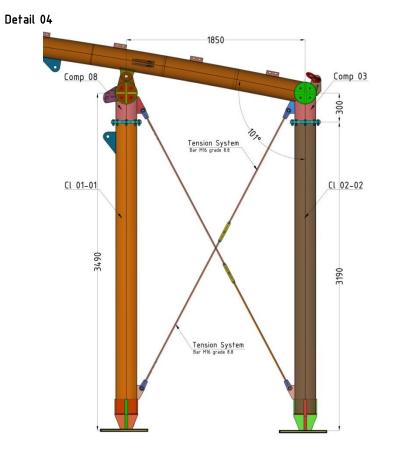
The above image shows the bracing detail for connecting columns to each other in bottom and top part and help them work as a single truss to prevent columns from torsion.
